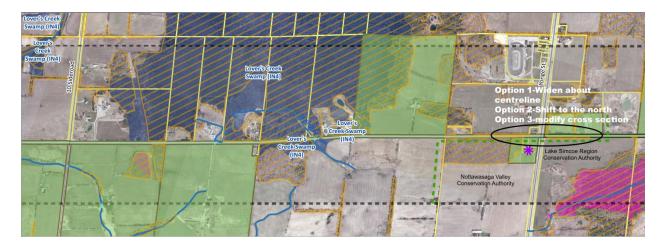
Sub-Section 2-5 – West of Yonge Street to east of Yonge Street
